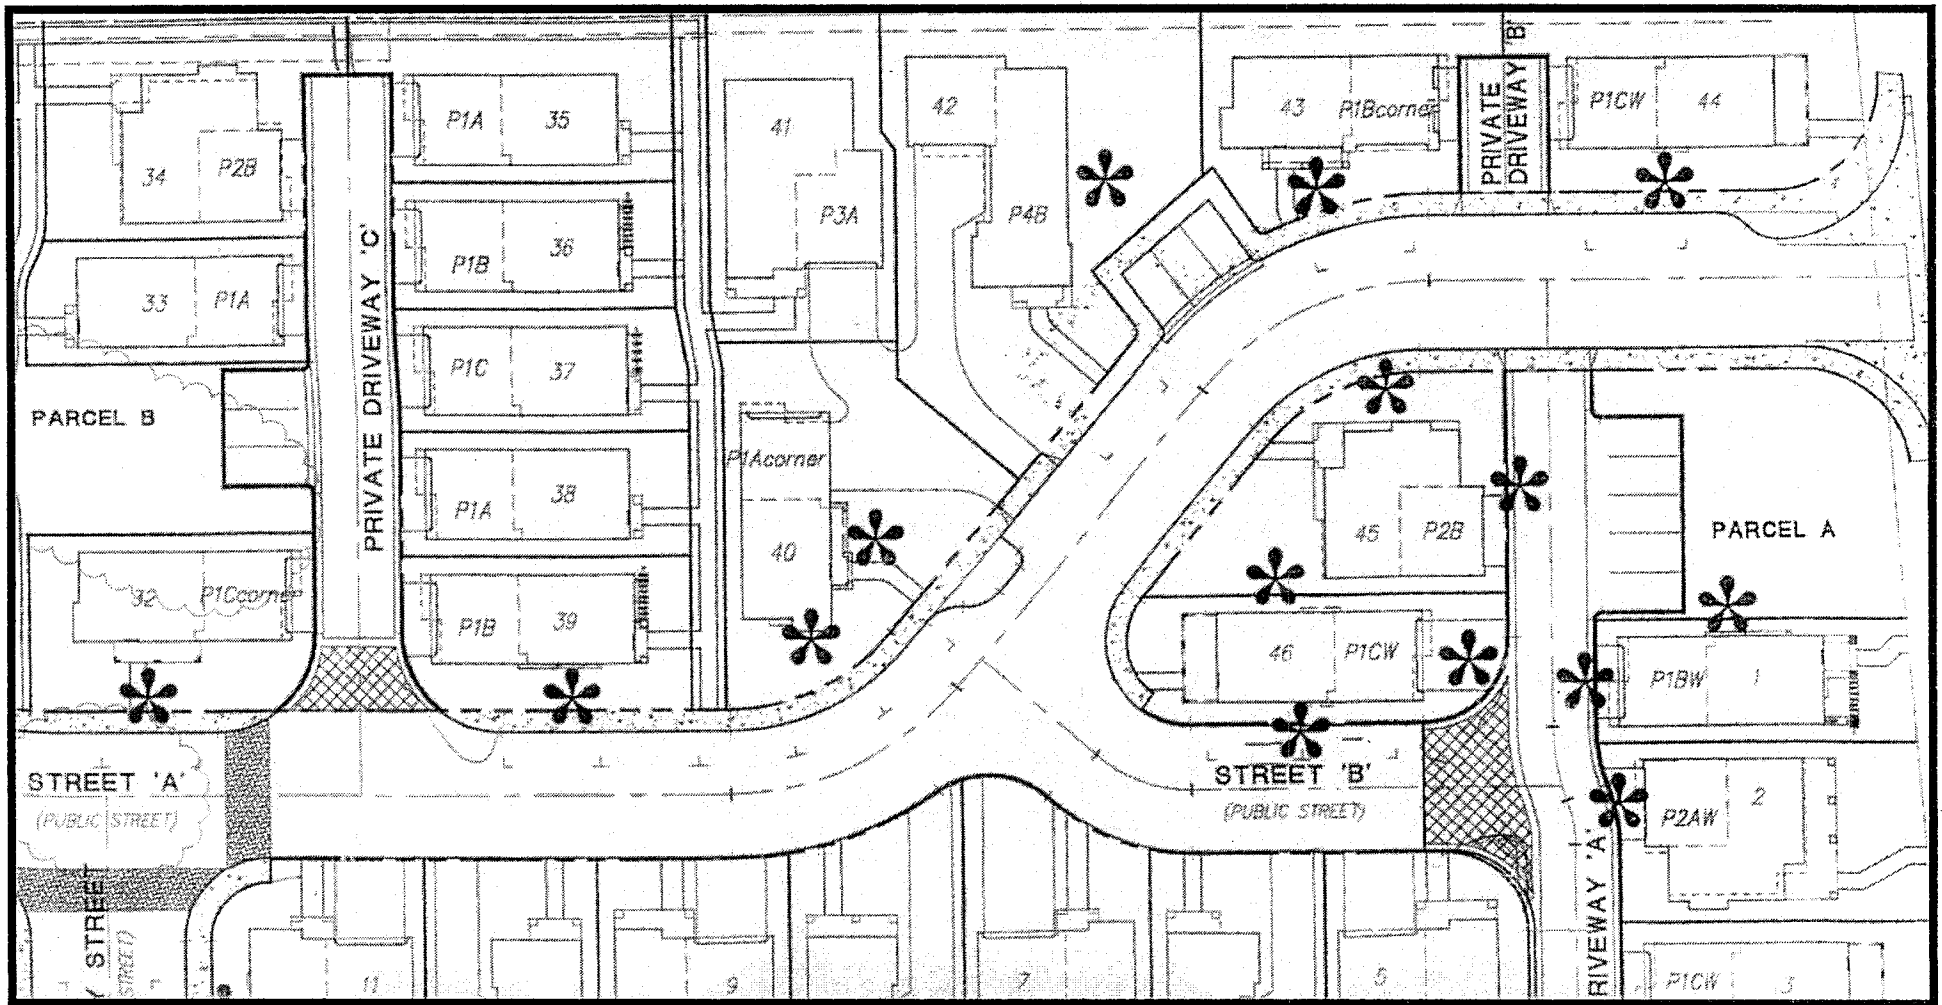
Exhibit A.	Partial Proposed and Alternate Conceptual Site Plans
